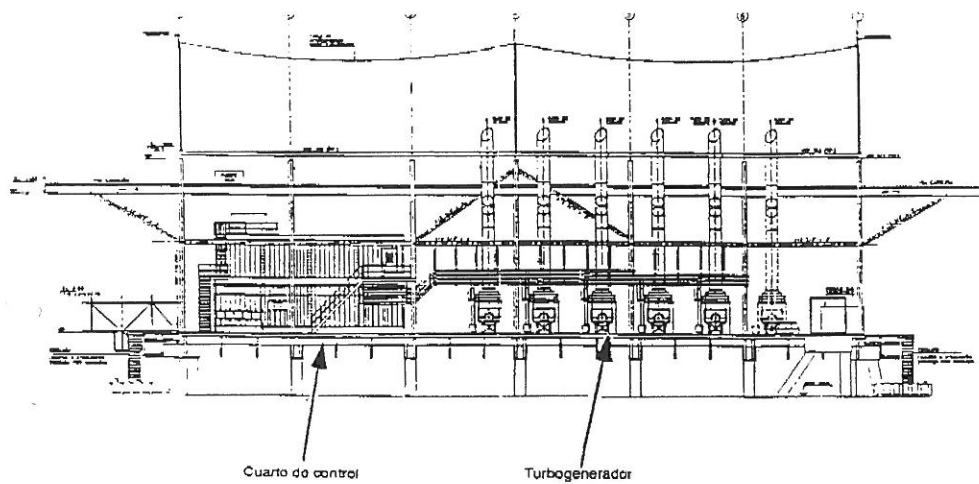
Elevation of multi-pile offshore structure (longitudinal)
